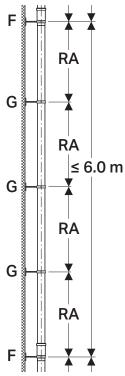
Configuration of anchor and sliding points for fastening on the wall
